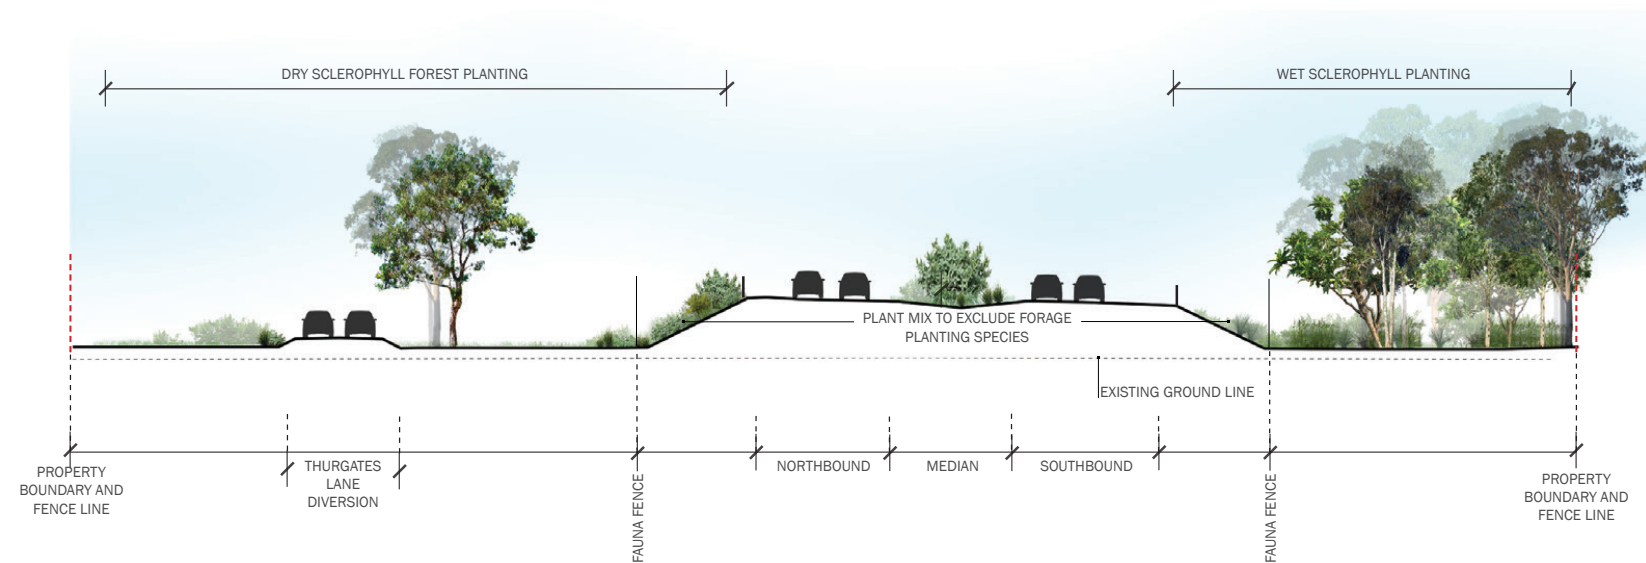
Cross section C-C in Wardell (Scale 1:400)
